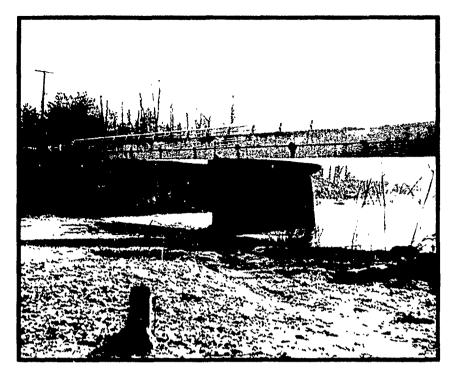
Upstream face of Lewis Road bridge, stream mile 12.8.
